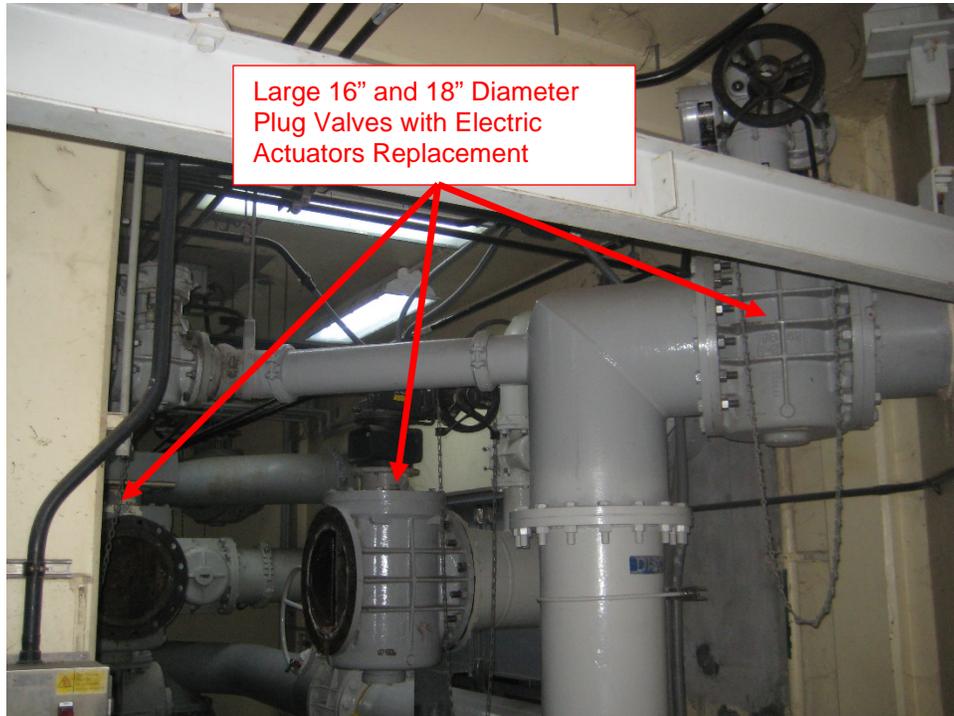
Existing Sludge Piping Inside Heating and Mixing Building No. 1
